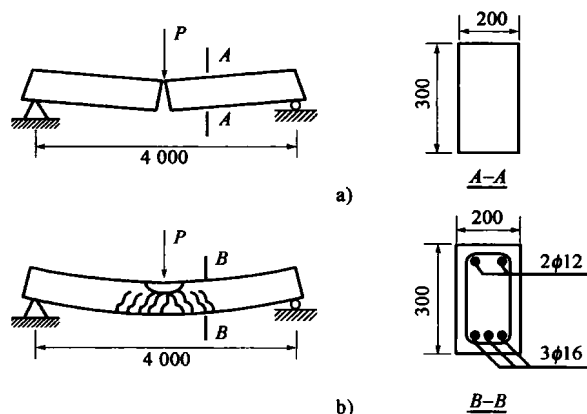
Concrete and reinforced concrete beams (unit: mm)
